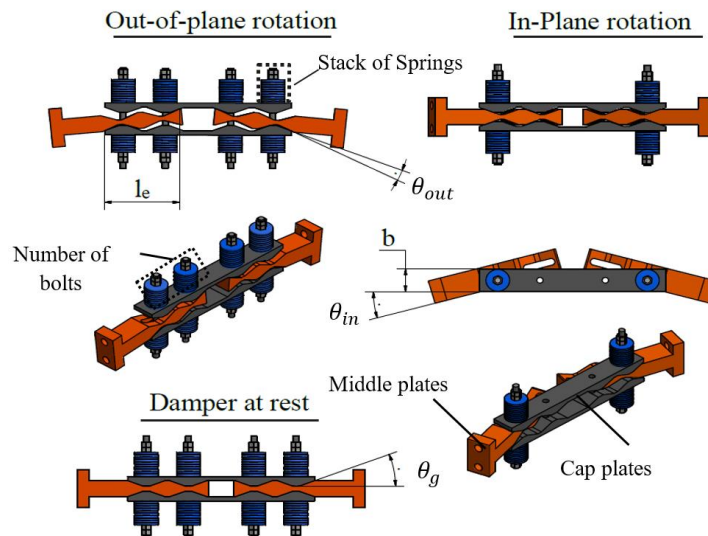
deformed shape of RSFJ: out-of-plane, and in-plane
